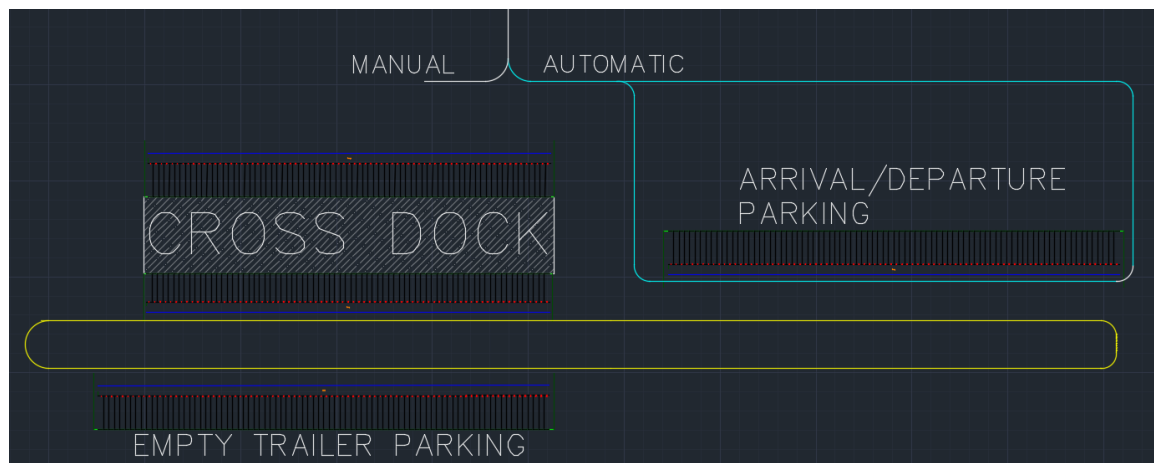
LAY-OUT OF PILOT LOCATION
